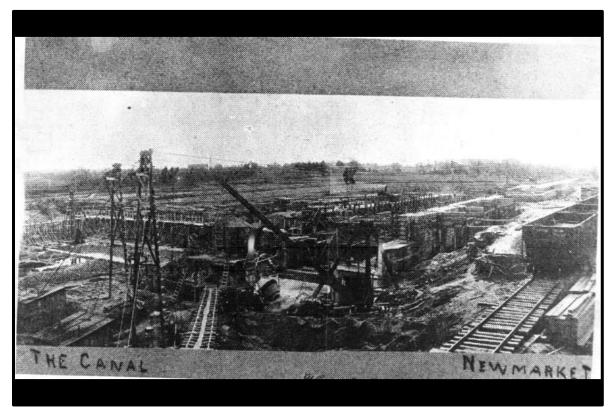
Newmarket Canal construction (Adapted from Dodge 2009)
